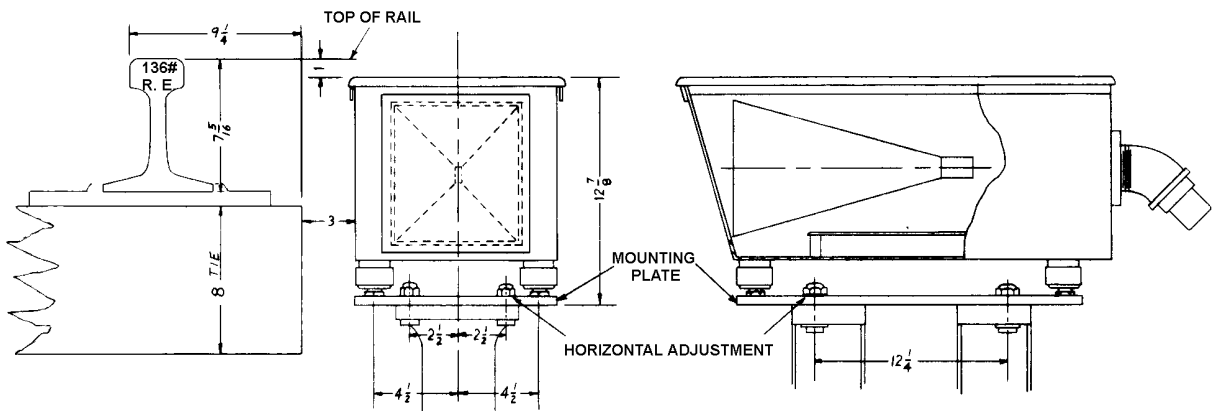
DR-50 Radar Horizontal Aiming Adjustments
